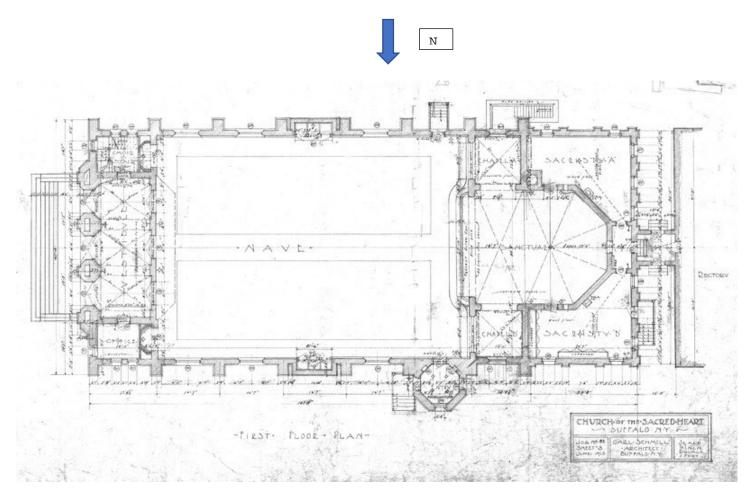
First Floor Plan, Church of the Sacred Heart (1913)
